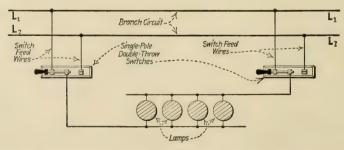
Single-pole double-throw knife switches used for two-location control.
